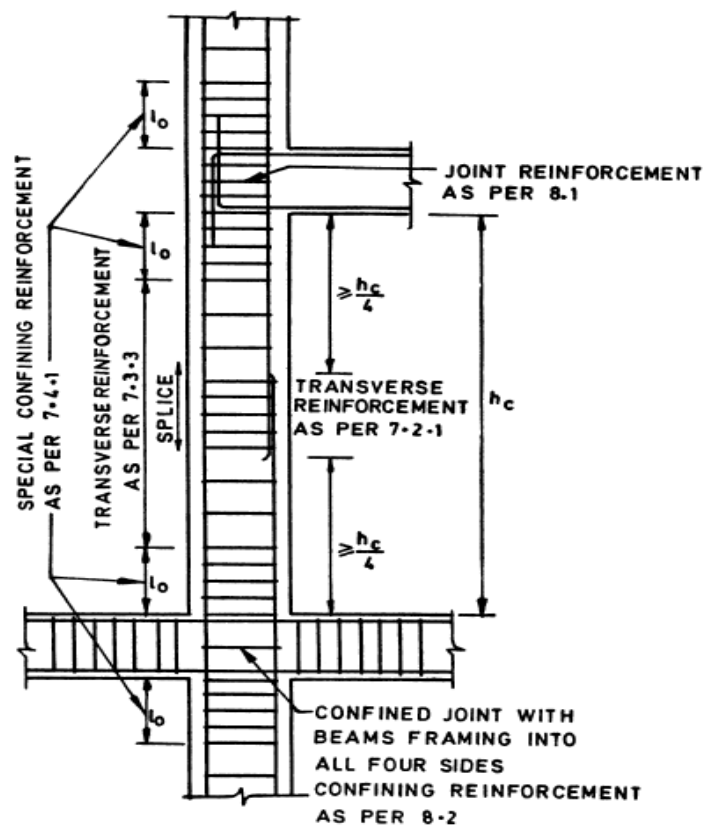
Special reinforcement in the joints (*ref. IS 13920:1993*)
